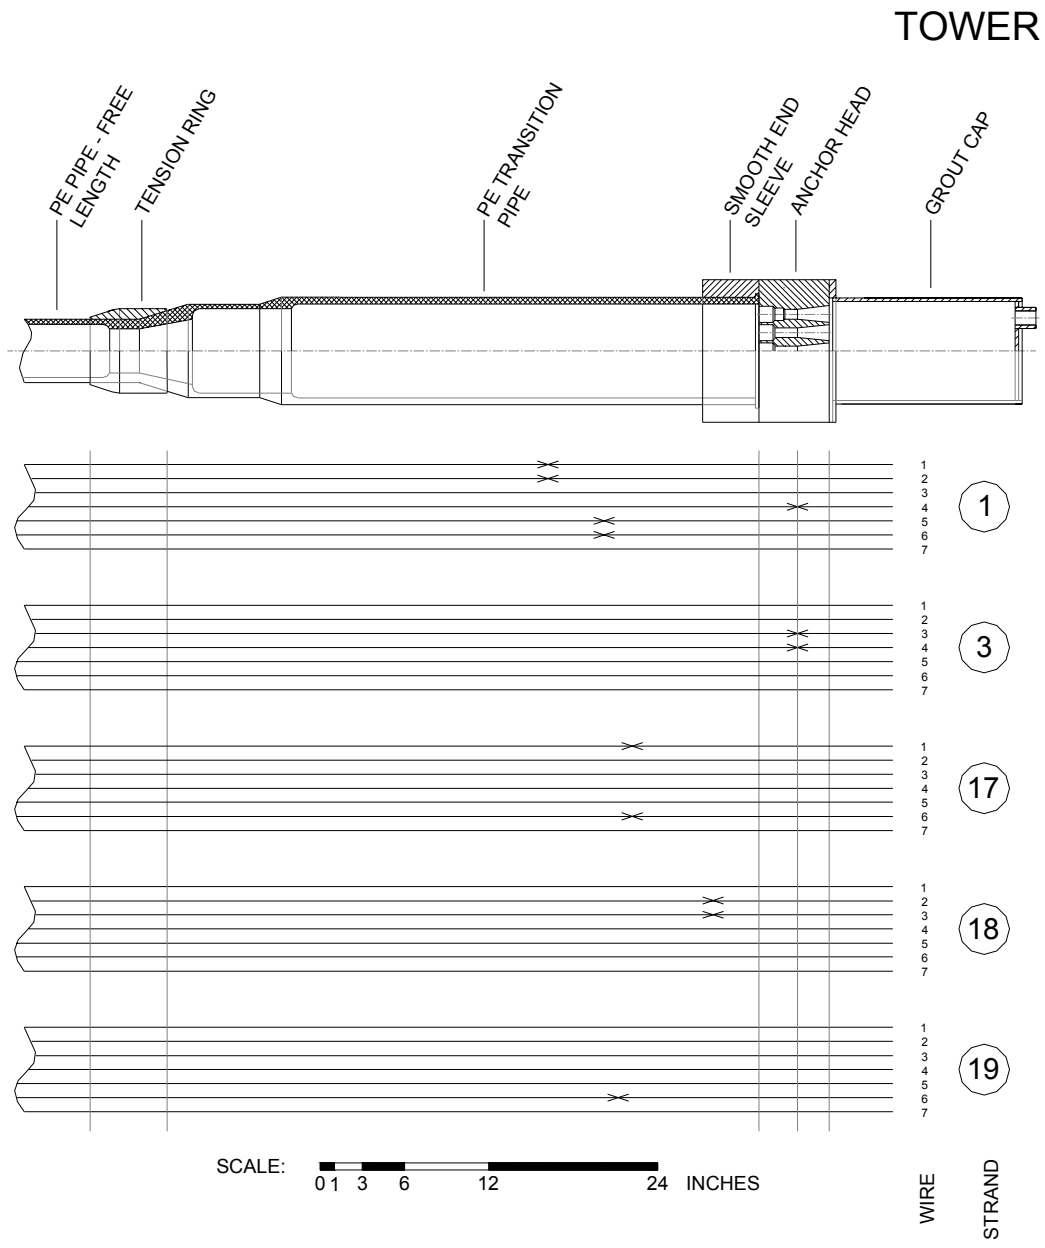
Location of wire breaks near tower anchorage - Specimen 9
